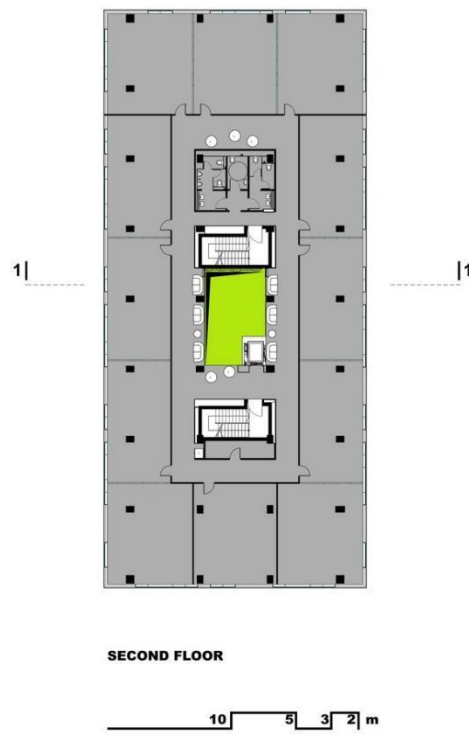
INCUBOXX incubator second floor plan (Source: Andreescu & Gaivoronsch Architects)
